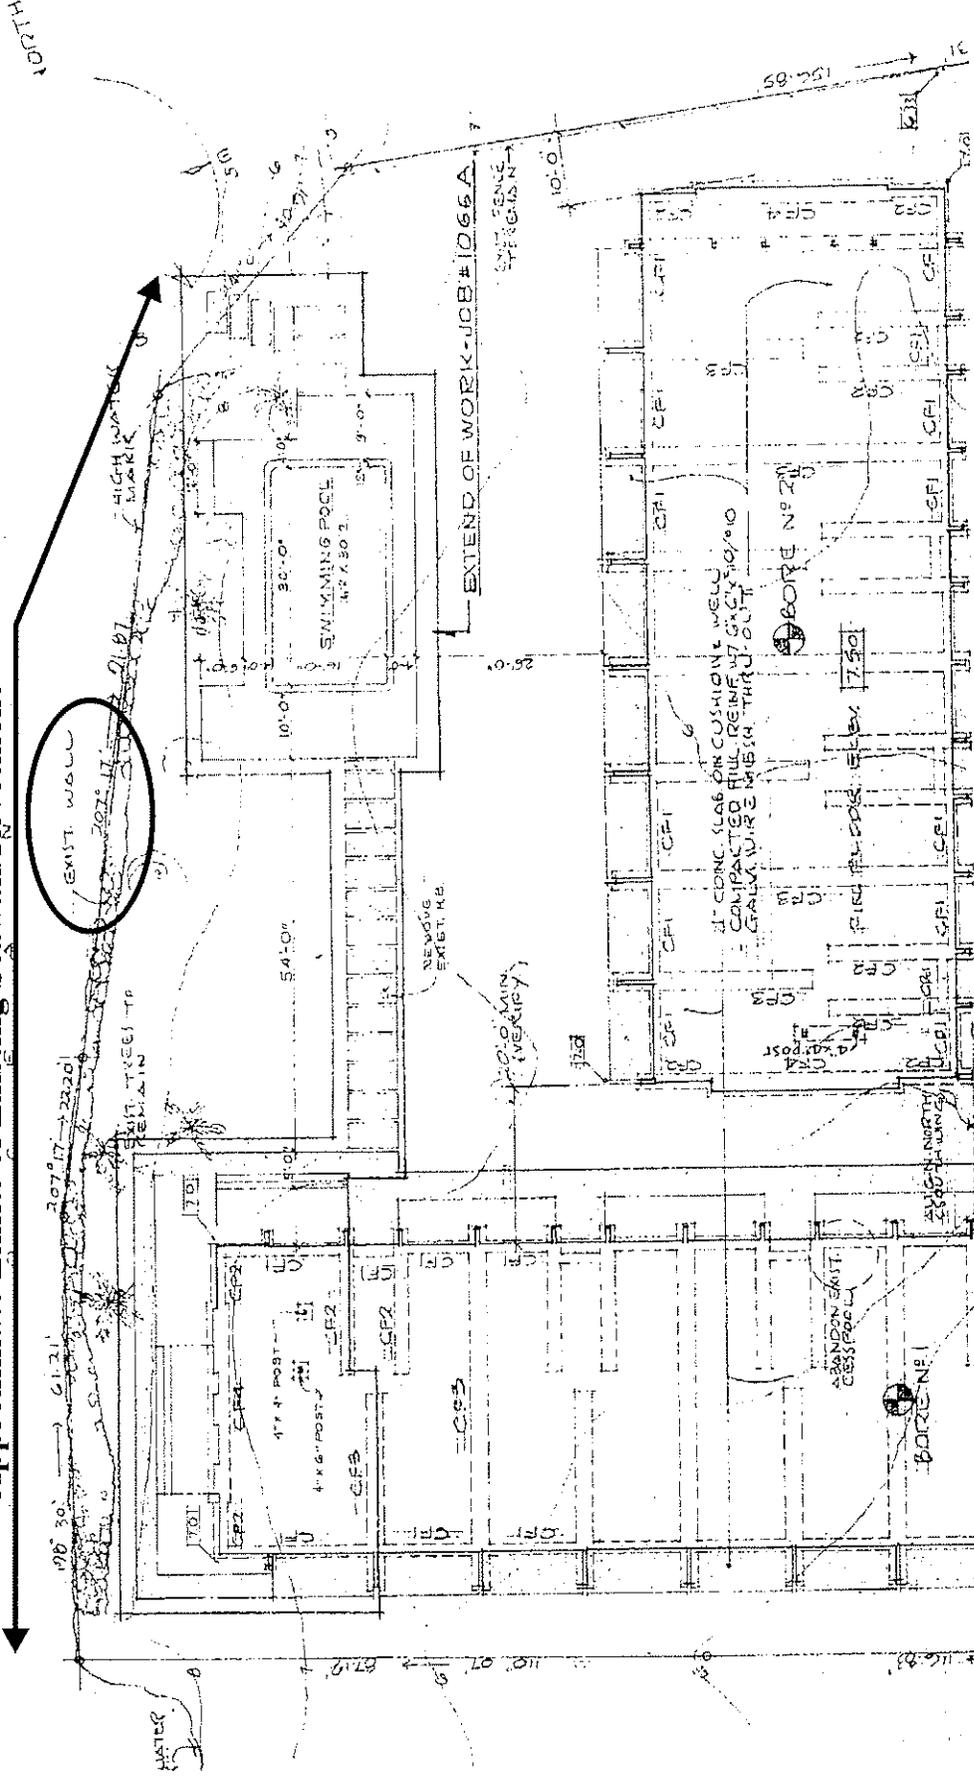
After-the-Fact Permitting for Improvements to Existing Seawall/Revetment Site Plan and Photo Reference Map
